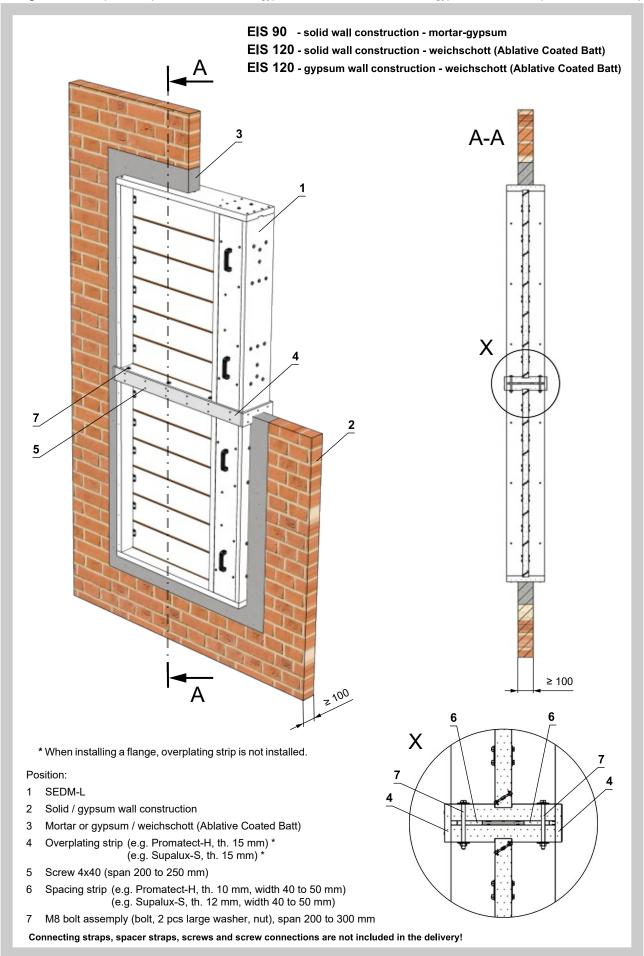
4 dampers - solid / gypsum wall construction - mortar or gypsum / weichschott (Ablative Coated Batt)
